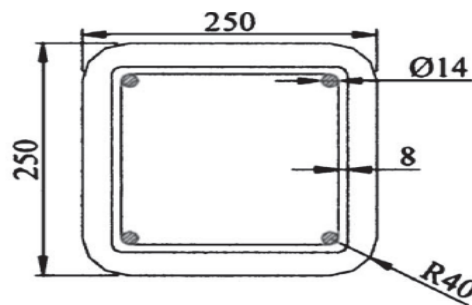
Cross-Section and Reinforcement detail of Specimen (Ilki et.al 2008)
